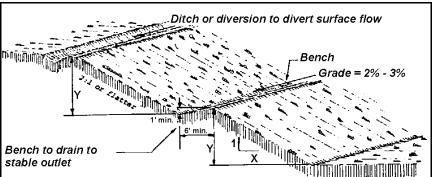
Land grading — benched slope details (*Maryland Department of the Environment, 1994*).
